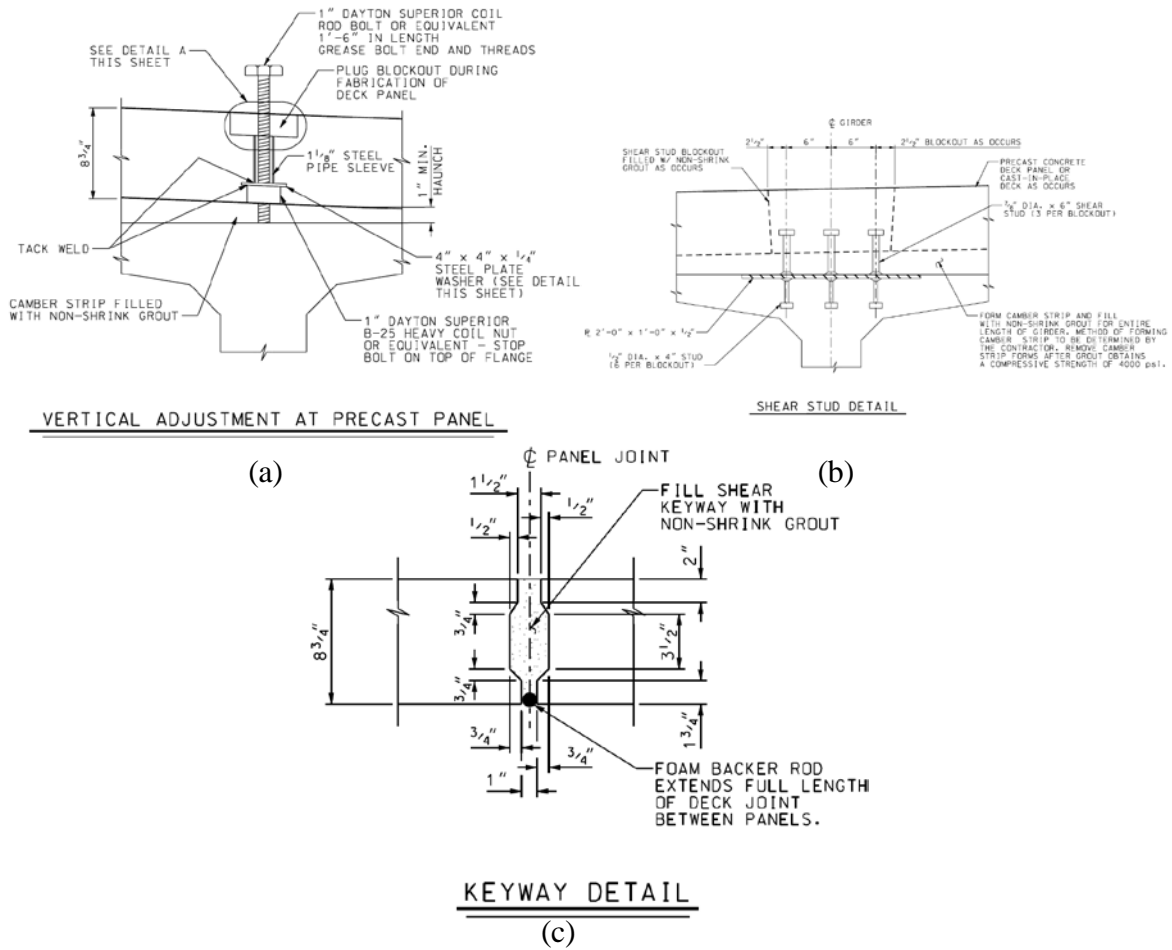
Typical FDPC deck panel details for Utah: (a) leveling bolts, (b) shear stud detail, and (c) keyway detail
